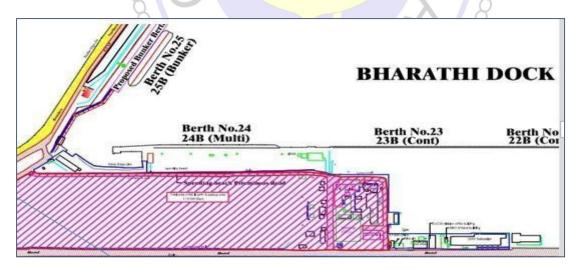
Bunker Berth at Bharathi Dock (Under Construction)
